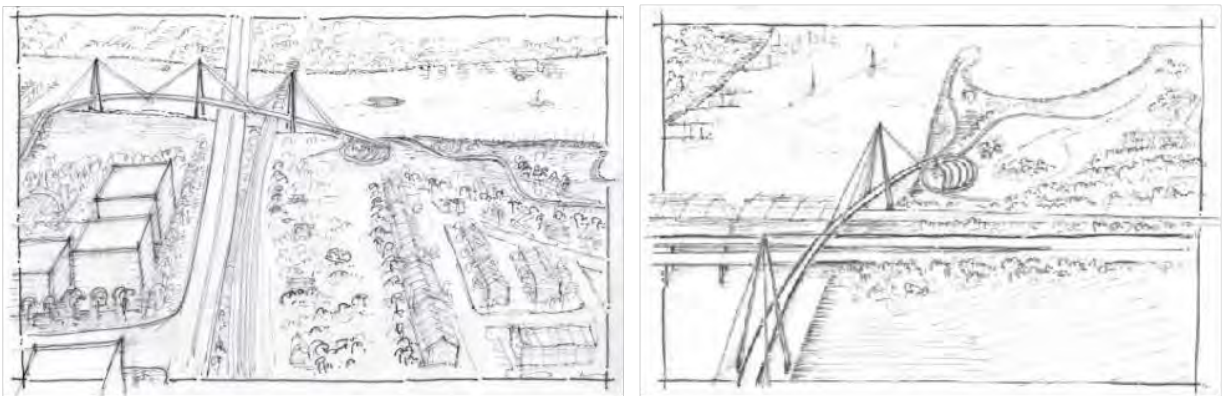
Concept Sketches of the Proposed Potomac Heritage National Scenic Trail Bridge Across U.S. Route 1
